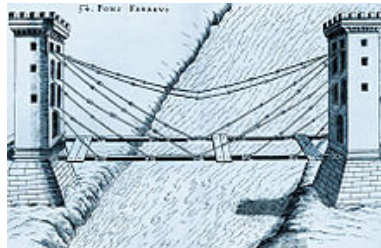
Cable-stayed bridge by the Renaissance polymath Fausto Veranzio,
